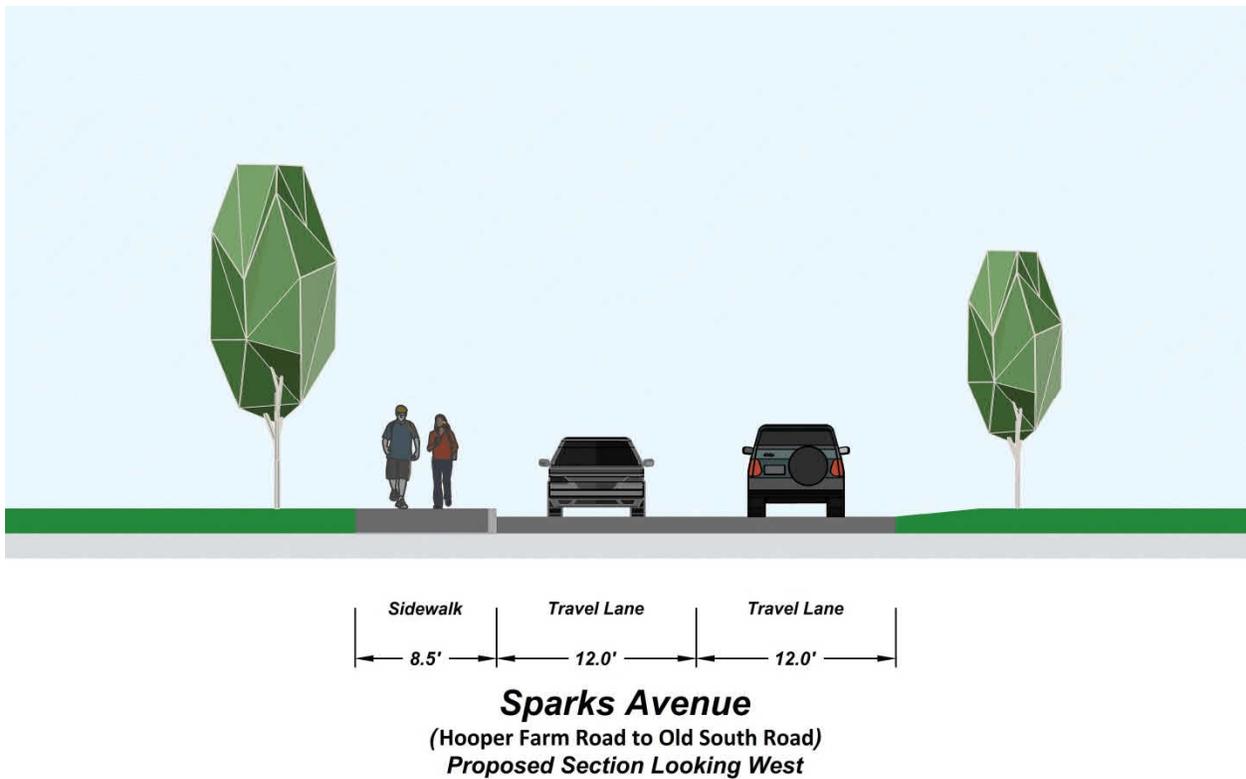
Sparks Avenue Proposed Typical Cross Section (with widened sidewalk)
